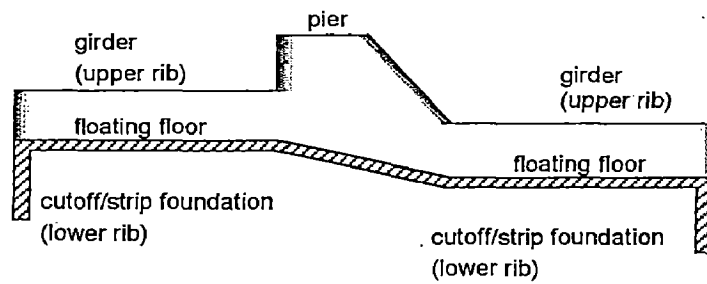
A BARRAGE WITH FLOATING FLOOR AND RIBBED FOUNDATION
